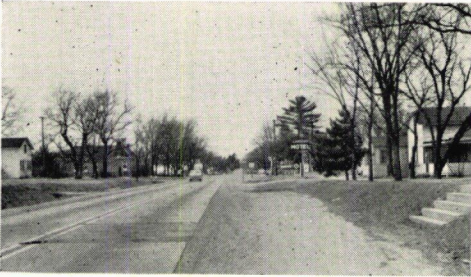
Location 4(a): Looking north on US 12 at Lake Delton.
